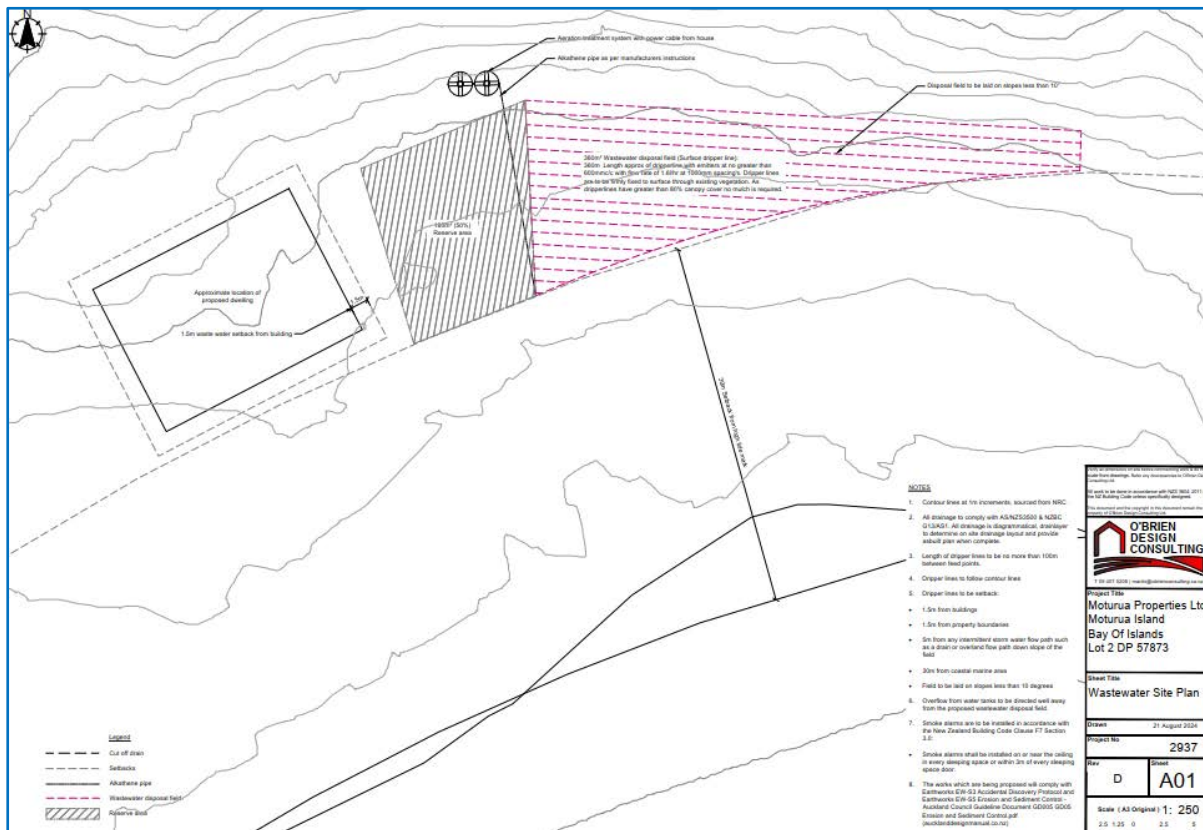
Wastewater Site Plan (Source: O'Brien Design Consulting Onsite Wastewater Report, Job No 2937.2 Rev B, 21 August 2024).
